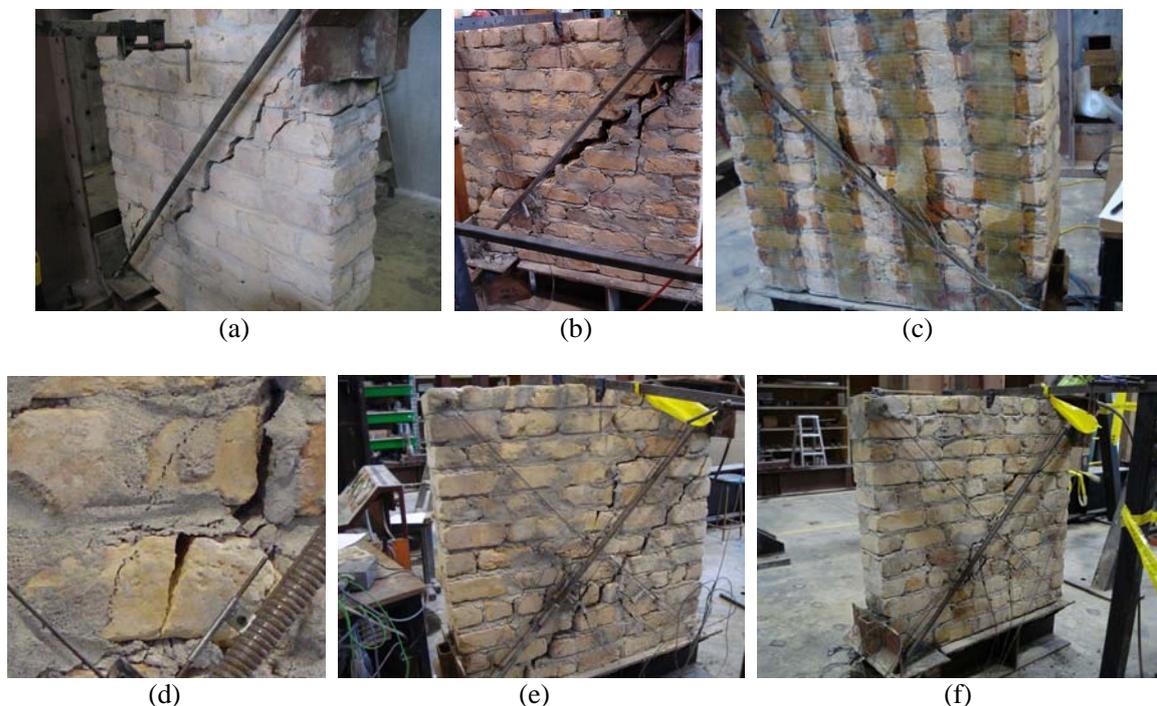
Test wallette failures: (a) DS-0; (b) DSG-3; (c) DSG-3 FRP debonding; (d) DSG-4, crack passing through brick and masonry joint; (e) DGS-4; and (f) DSG-5.
